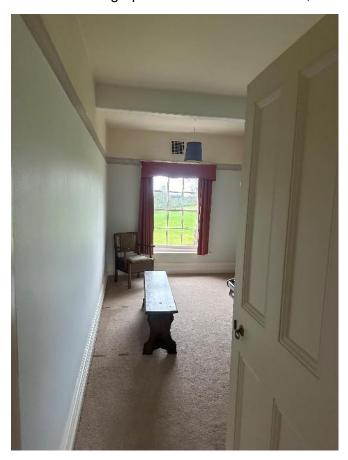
Photograph showing area for attic floor bathroom – tanks to be removed (S Pemble)
